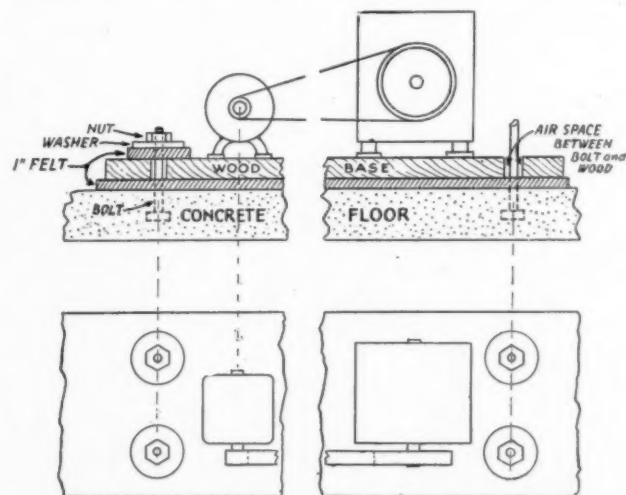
Diagram of construction for attaching machine footings to building structure so as to minimize vibrations.
